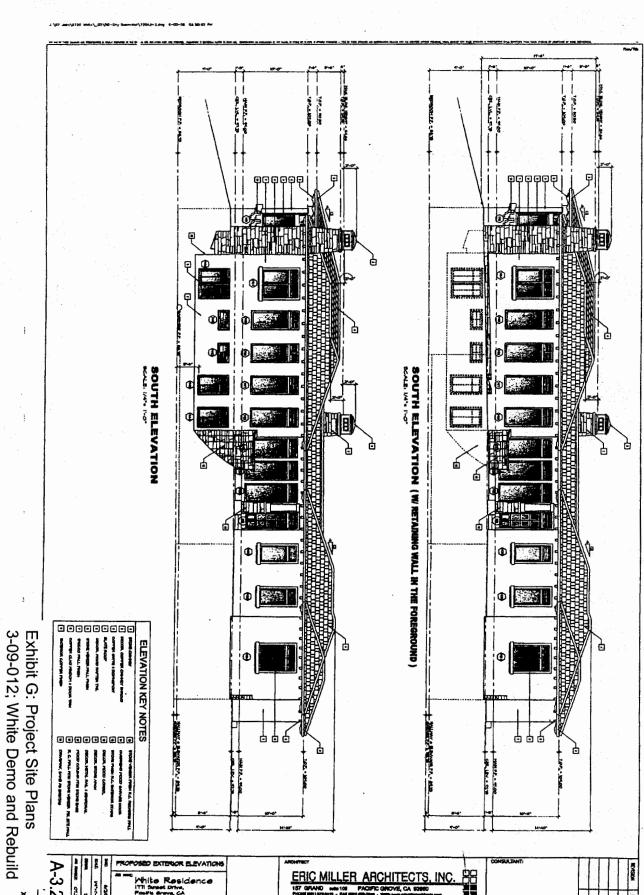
Exhibit G: Project Site Plans 3-09-012; White Demo and Rebuild Page 5 of 6
